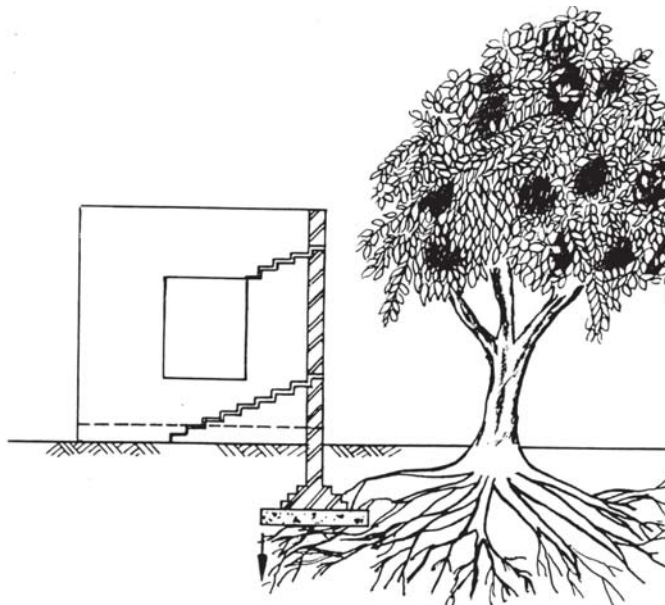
Trees Growing close to a building on shrinkable soil may cause cracks in the walls
